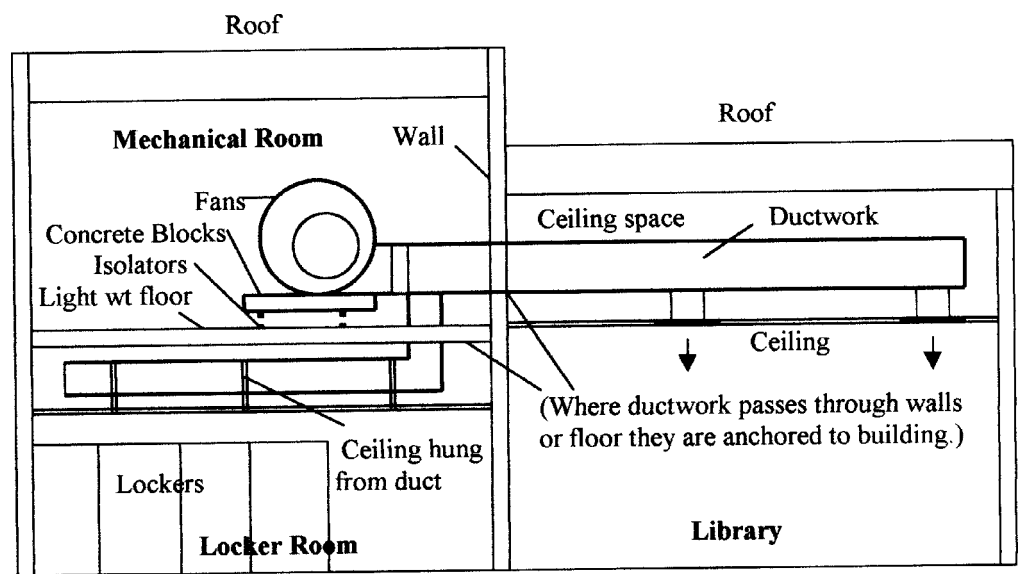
Elevation cross section of mechanical room with 30 pieces of rotating equipment transmitting vibrations and loud rumbling noises to the floor of the equipment room, and to adjacent areas of the library and locker rooms.
